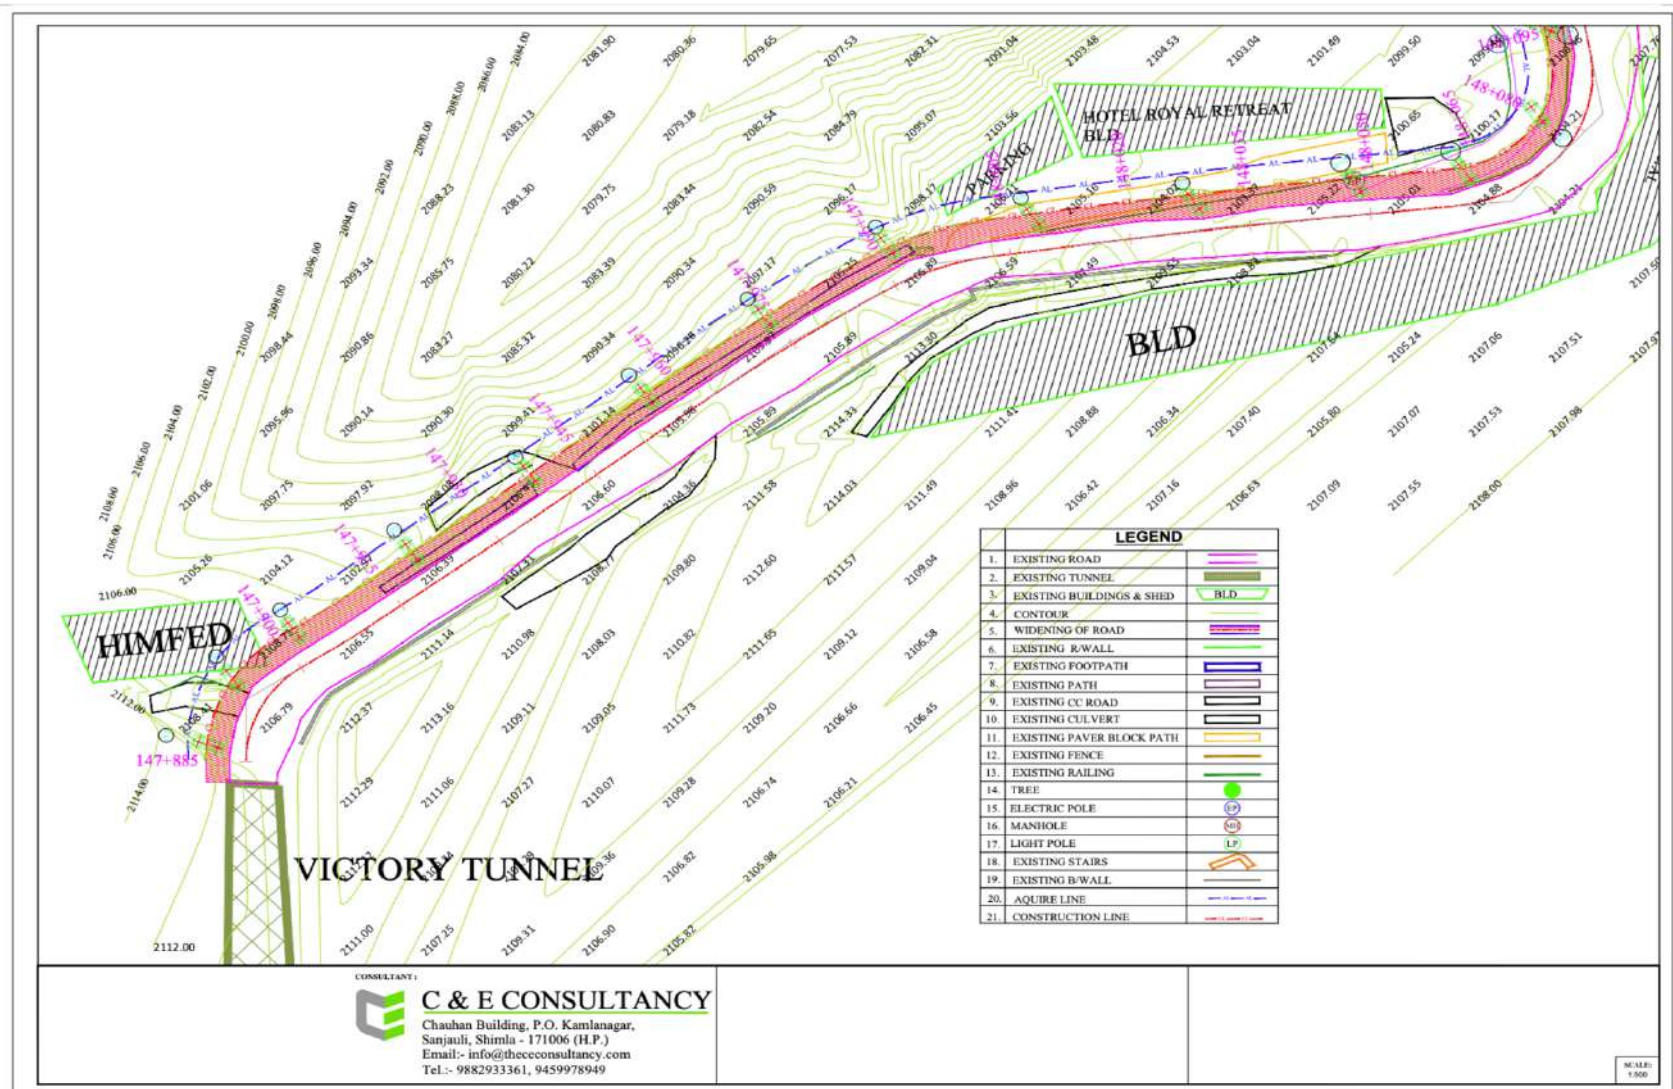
Proposed Road Design for the Improvement of MDR-67 Road Section (Victory Tunnel to Auckland Tunnel) - 1
